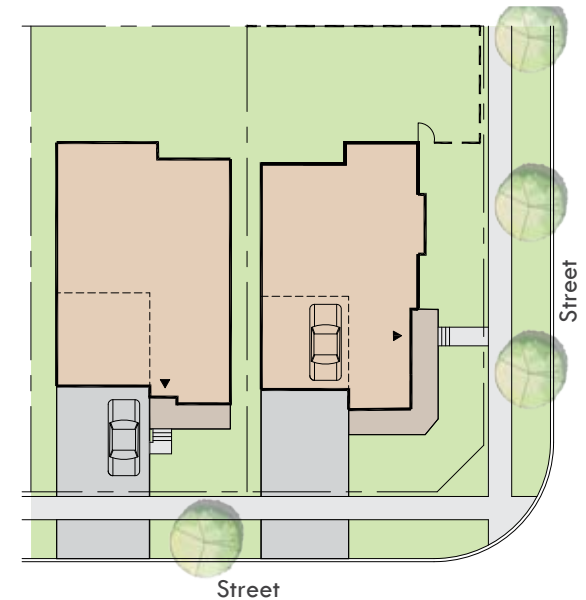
Conceptual Siting of Single Detached Dwellings
